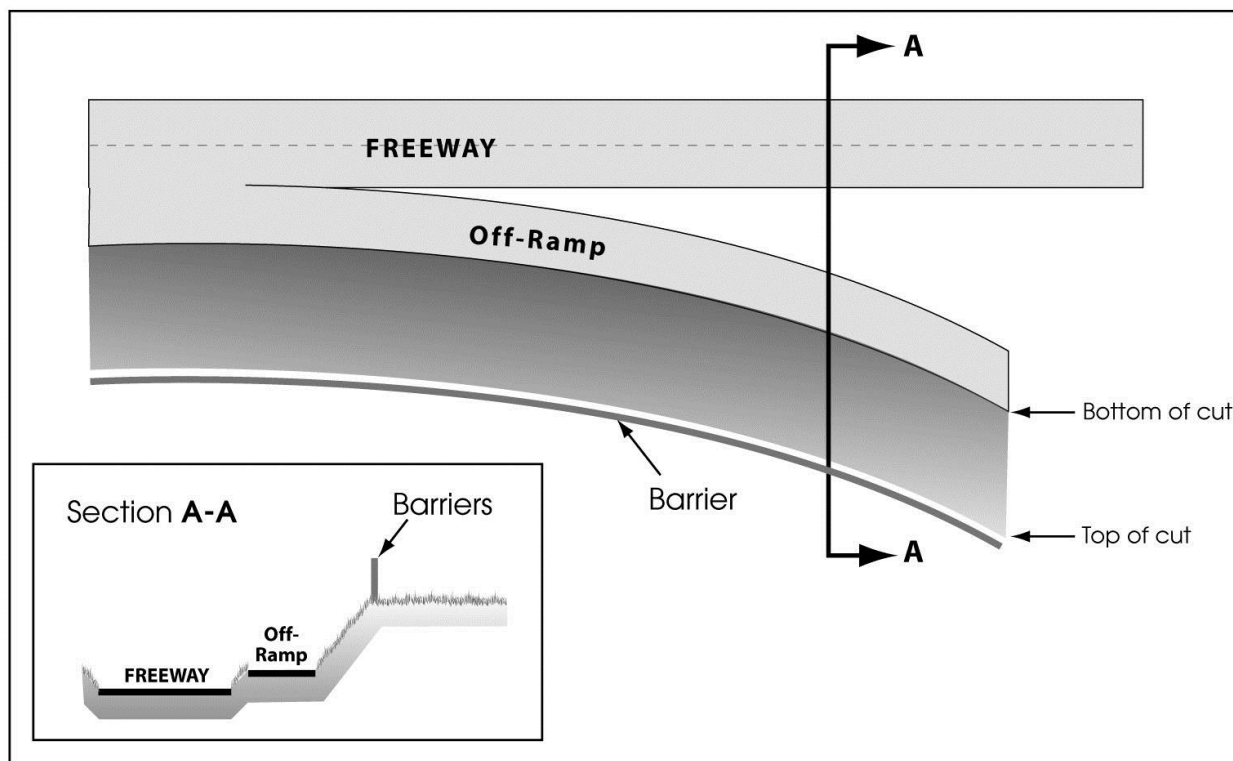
Barriers for Highway in Cut with Off-Ramp
